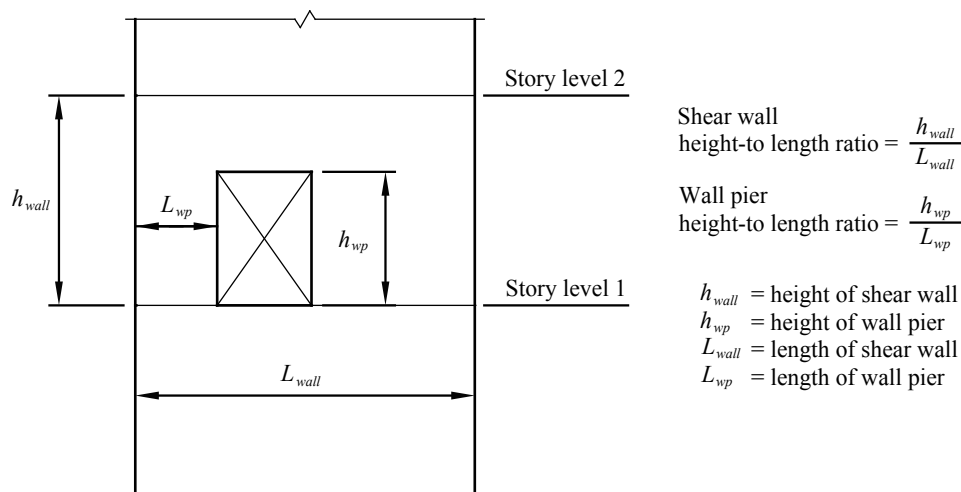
Shear wall and wall pier height-to-length ratios.
